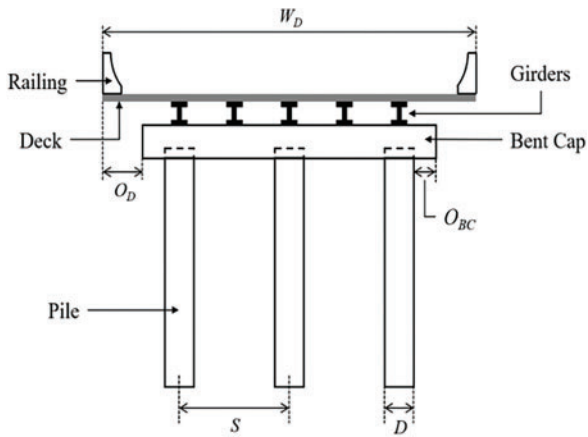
Illustrative drawing of pile bent pier and girder deck superstructure. W_D is deck width, O_D is deck overhang, O_{BC} is bent cap overhang, S is pile spacing, and D is pile size
